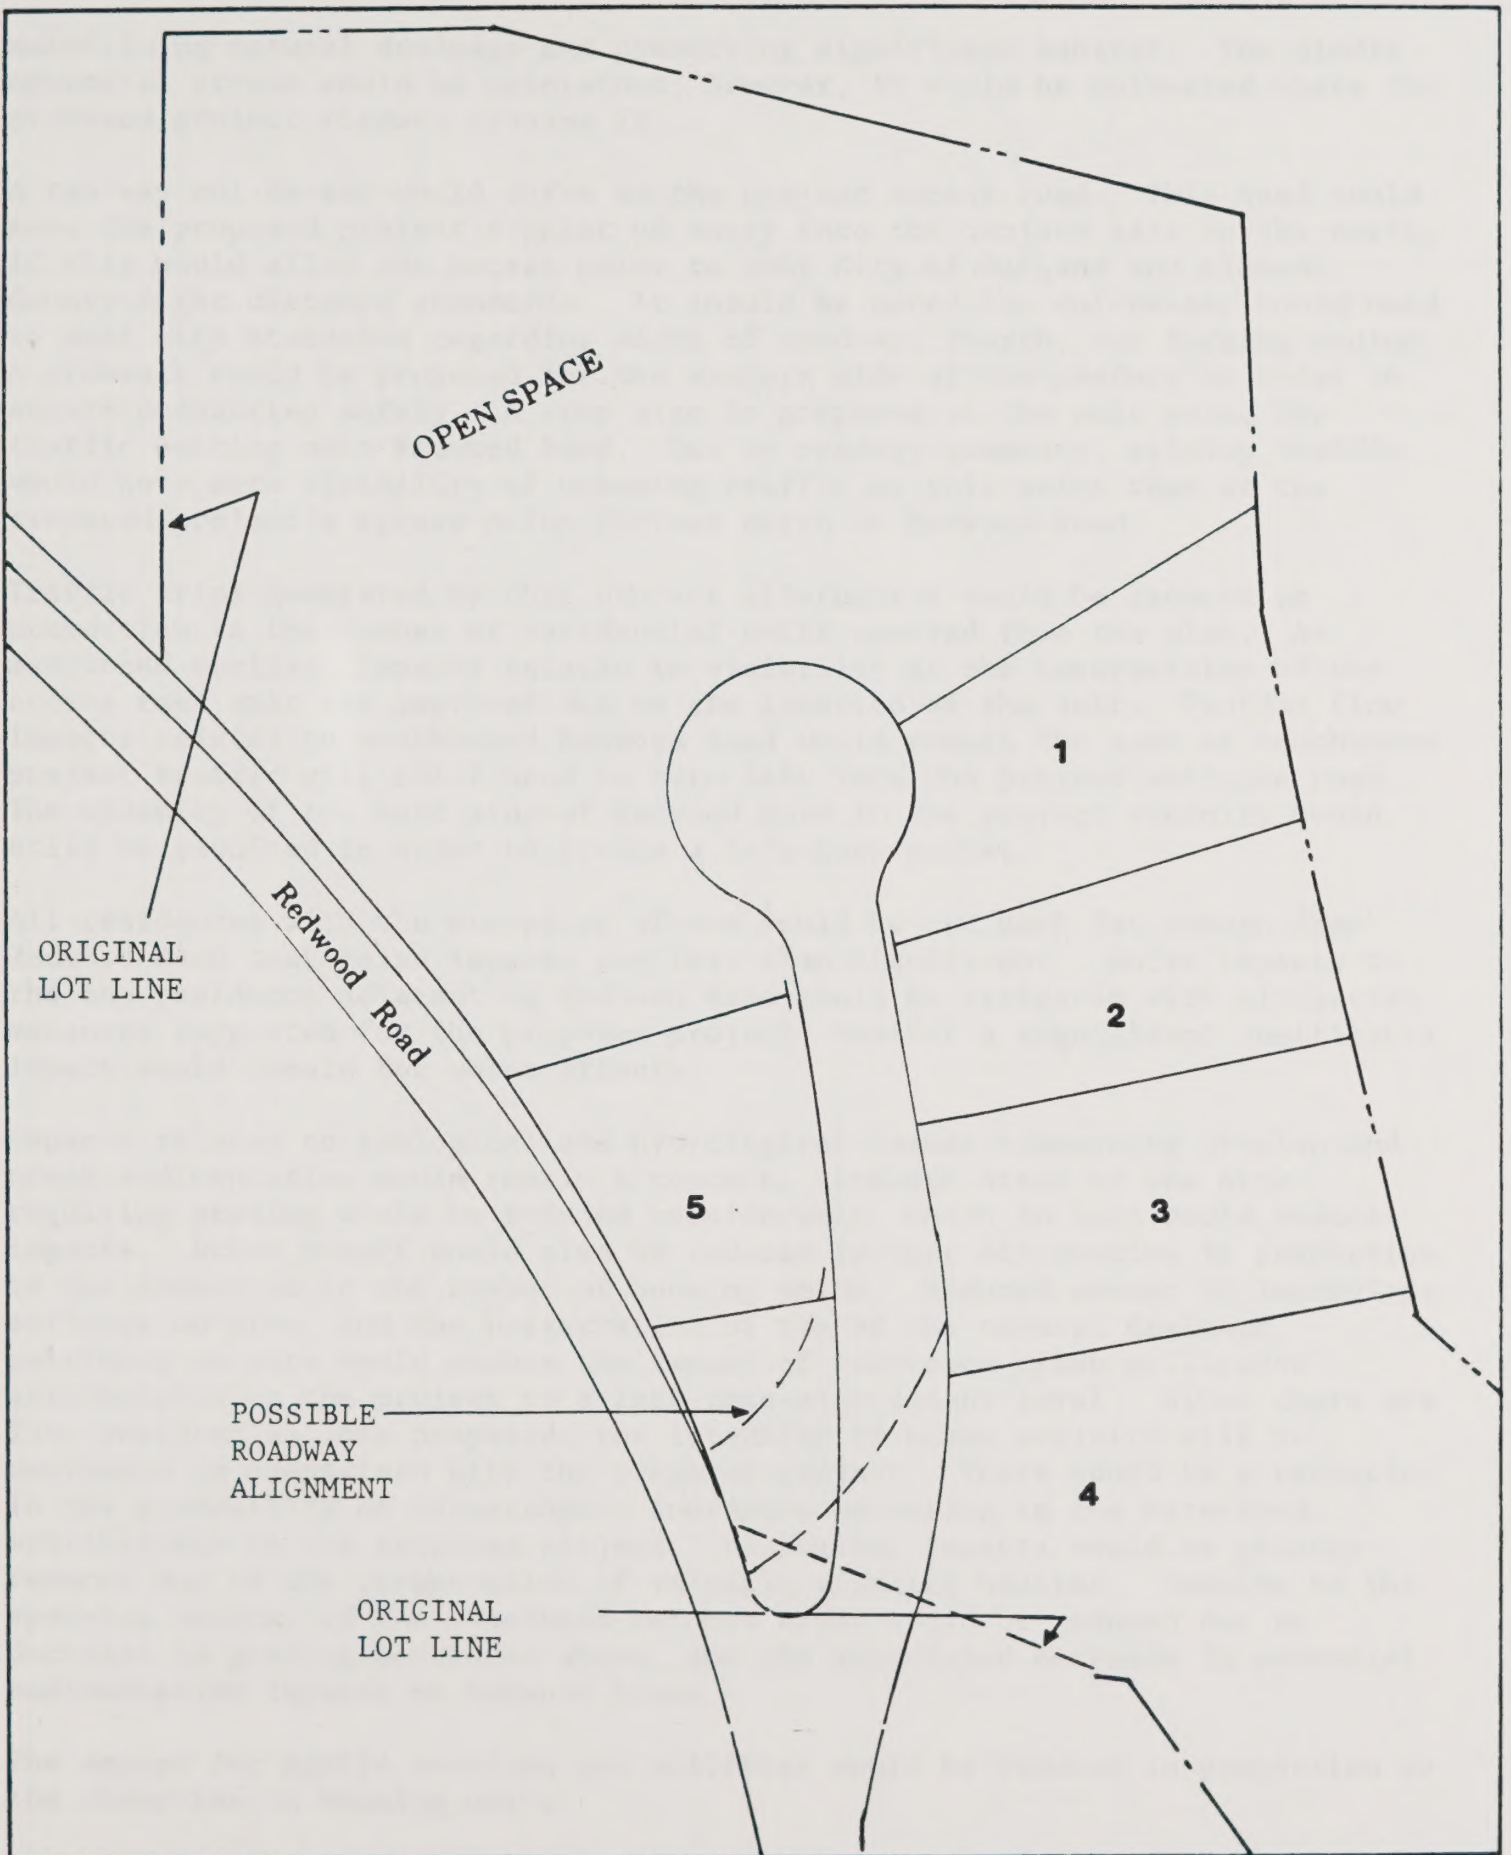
CONCEPTUAL SITE PLAN FOR THE MITIGATED ALTERNATIVE
